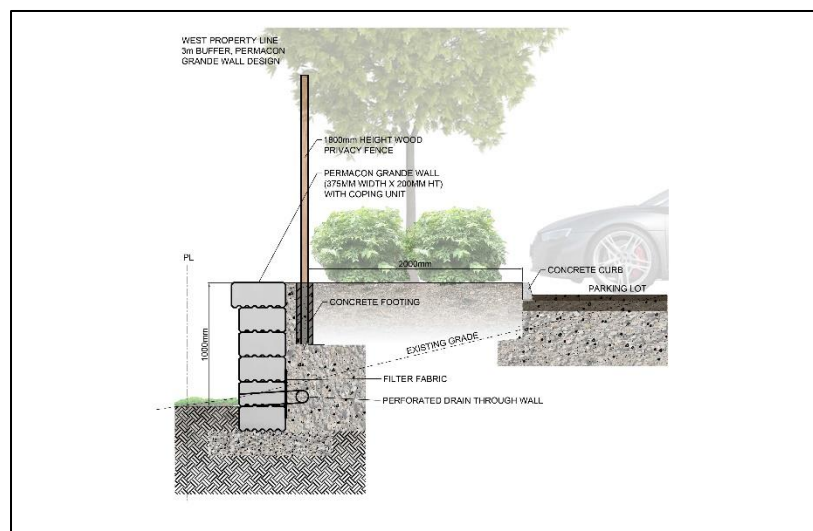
Retaining Wall and Landscape Buffer Strip Cross Section
